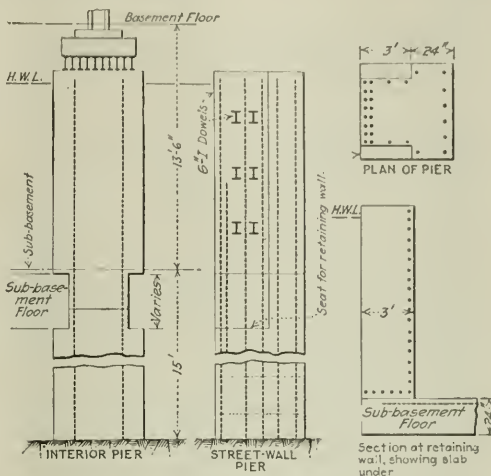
CONNECTION OF SUB-BASEMENT FLOOR TO PIERS AND RETAINING WALL
